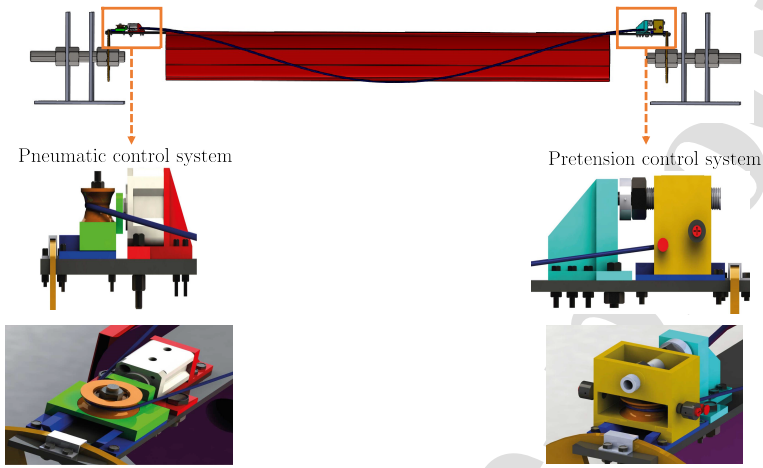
Layout of the tensairity prototype. The top picture shows the inflatable element, rope, strut, control mechanisms and supports. Details of pneumatic and pretensioning control systems are given in the close-ups on the bottom.
